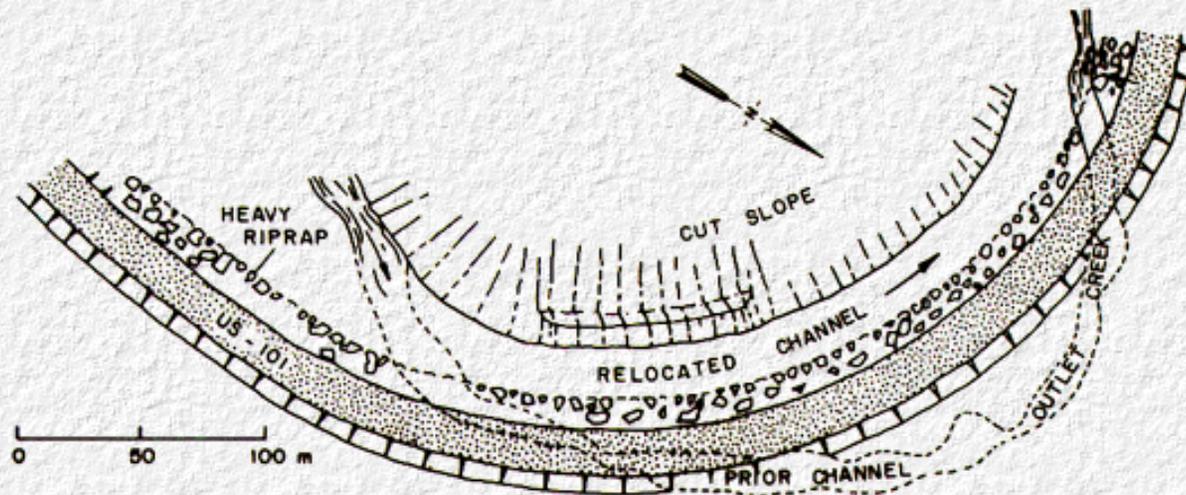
Plan Sketch of Channel Relocation, Outlet Creek
